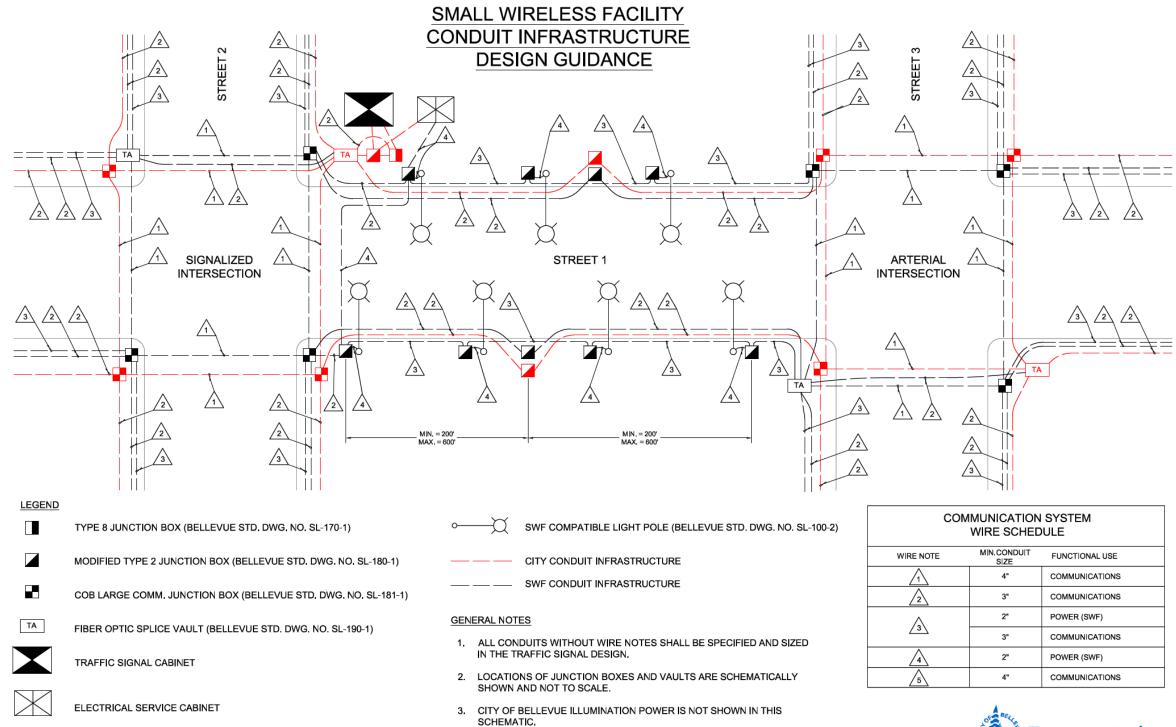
Small Wireless Facility Conduit Infrastructure Design Guidance
